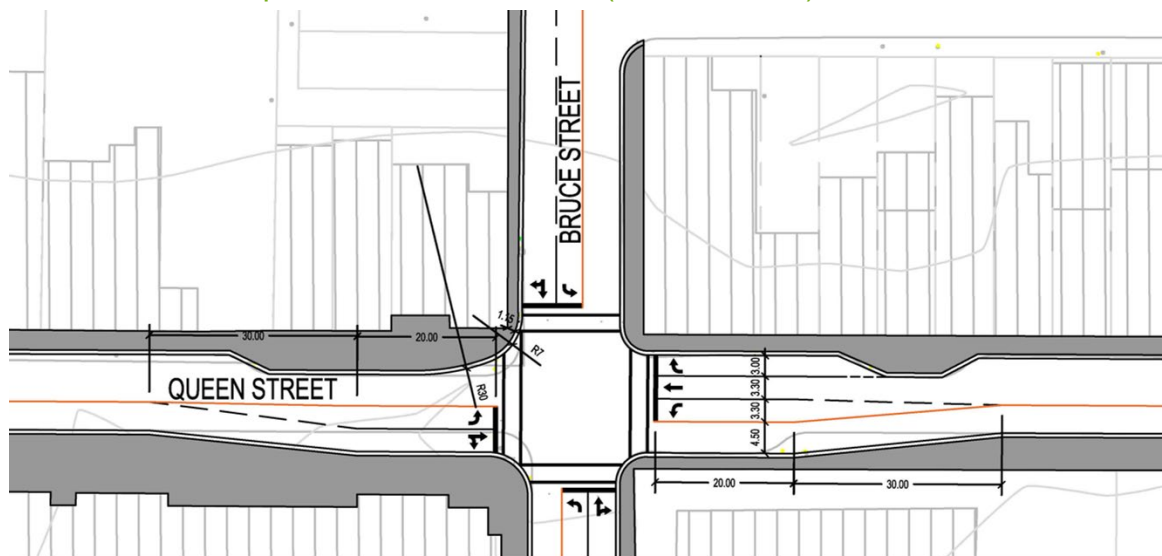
to Exhibit 4.7 illustrate the typical cross-sections and plan views for Alternative 3.
